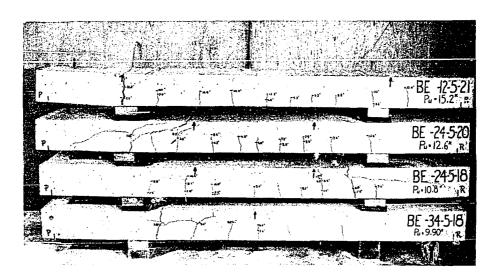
Typical shear-bond failures of beams constructed with deck E-20 gage. Each beam was 12 inches wide and 6 feet in length
